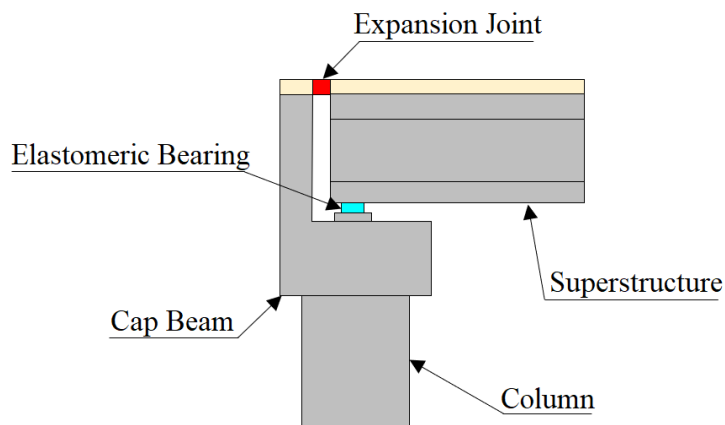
Gaps between girder ends and cap beam wall at abutment lines
